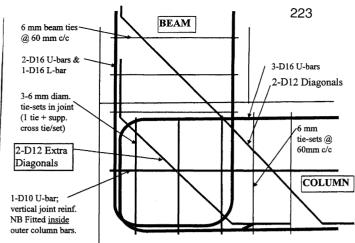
Knee Joint 14 with extra diagonal bars through joint and re-entrant corner.
